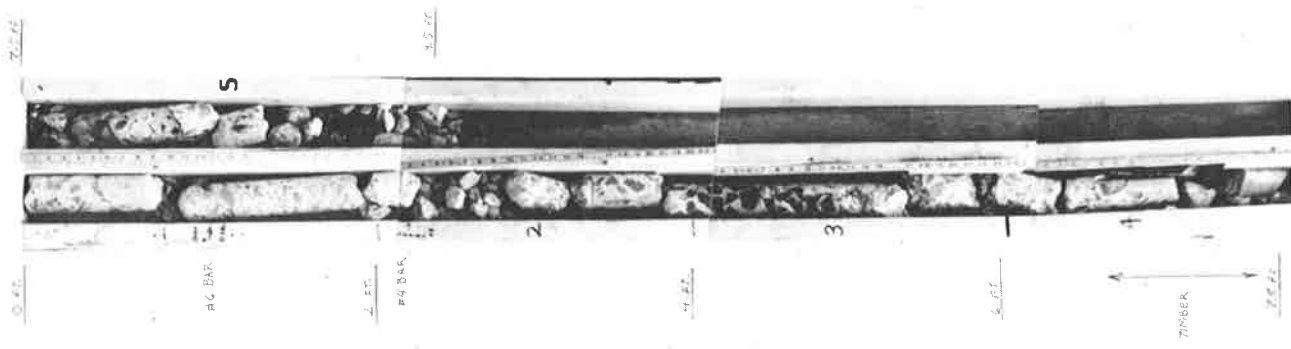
Core No. 8 taken horizontally from Pier 2 foundation .
